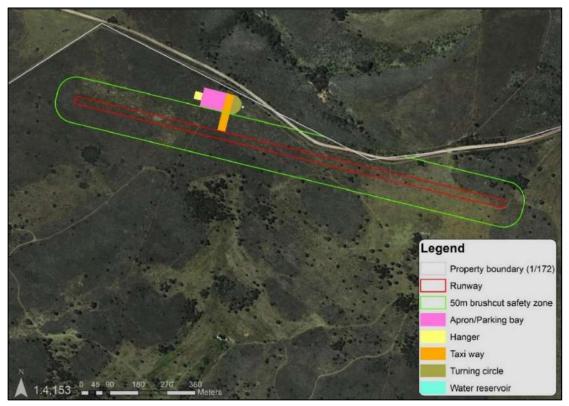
Site Plan for proposed runway on Portion 1 of Farm 172.
